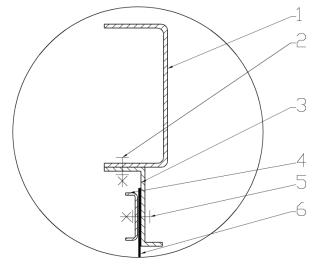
Typical method of installation of mcr PROSMOKE S CE curtain to a steel sheet element using machine screws
